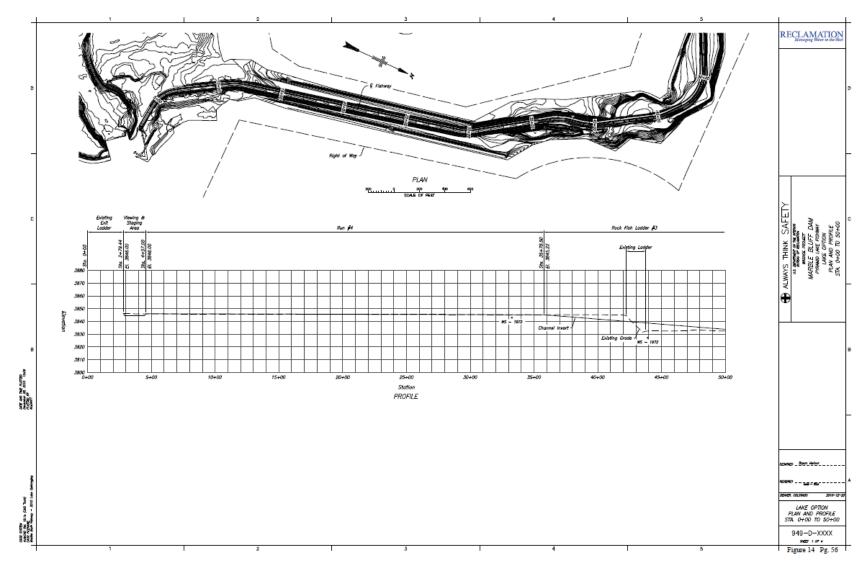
Lake fishway – plan and profile – station 0+00 to 50+00
